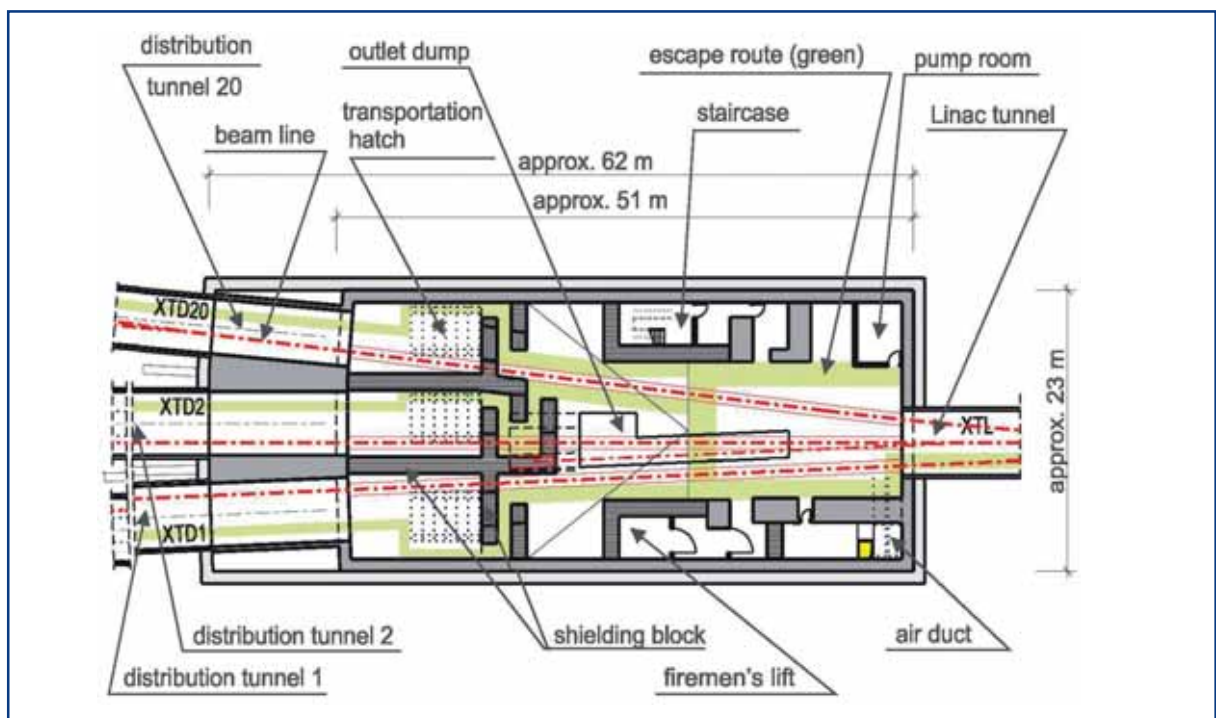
Layout for the ground floor of the distribution shaft building XS1.
